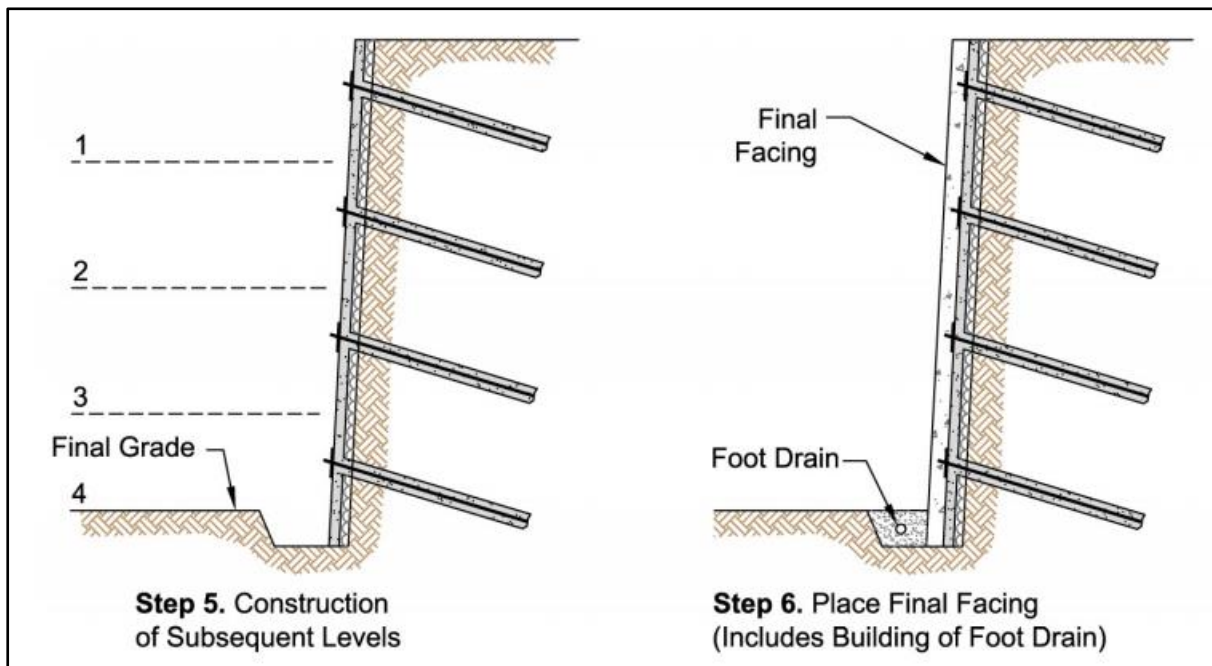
Typical Soil Nail Wall Construction Sequence; Adopted from (Lazarte, et al., 2015)
